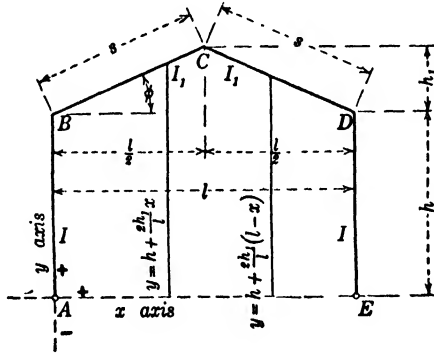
General Dimensions of Ridge Frame. (See p. 294.)
